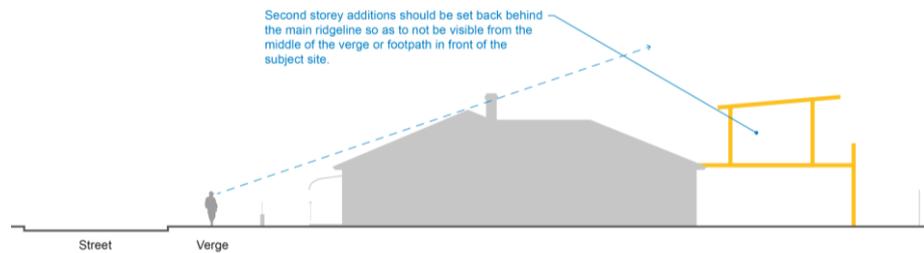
Flat and skillion roof forms, when used for additions can be less dominant than gabled roof forms.
